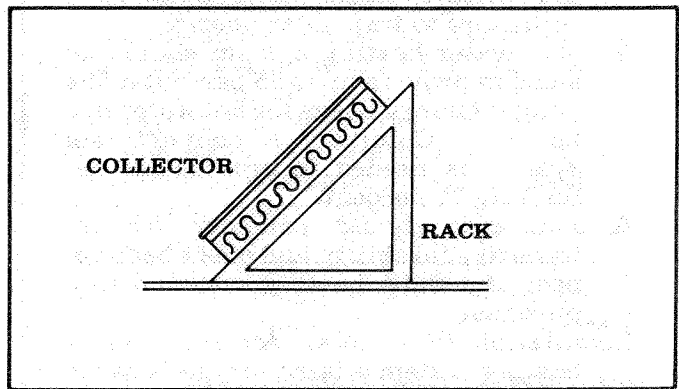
Rack mounting. Collectors can be mounted at the prescribed angle on a structural frame located on the ground or attached to the building. The structural connection between the collector and the frame and the frame and the building or site must be adequate to resist any impact loads such as wind.
